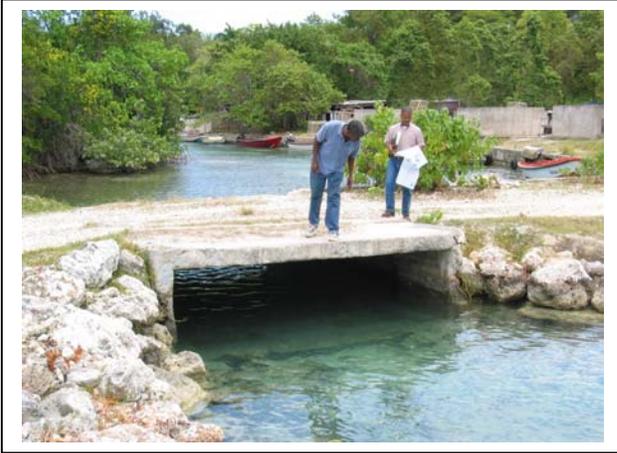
Culvert at causeway between mainland and headland at Oracabessa Bay.
